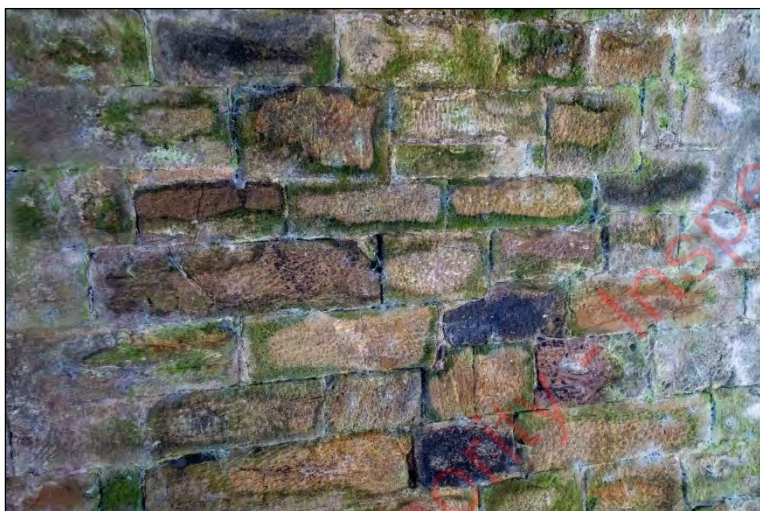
Bridge Site 3 had bat potential also but was too high to survey the crevices.
